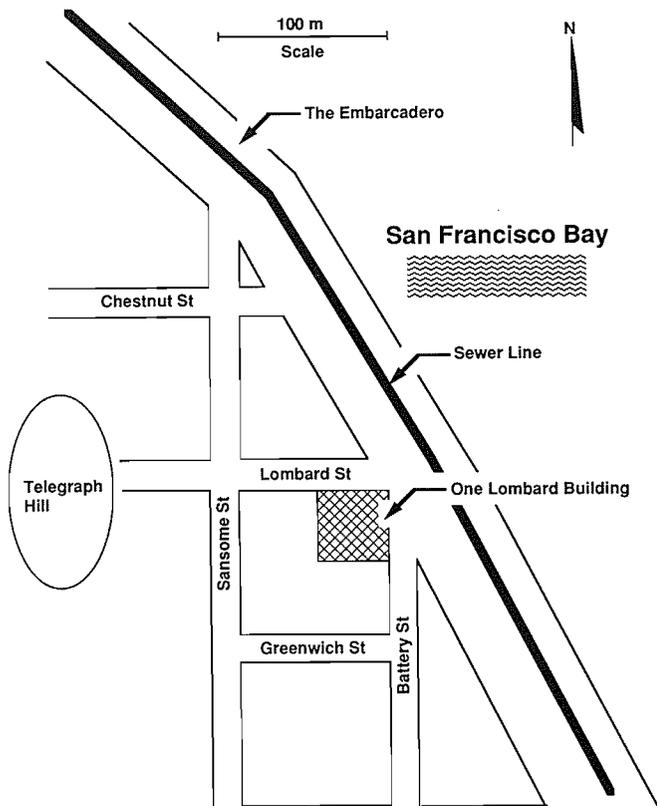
The One Lombard Building, northeast of downtown San Francisco.
